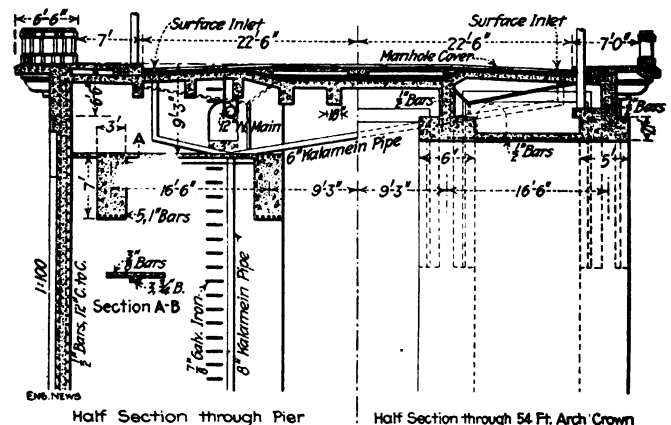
CROSS-SECTION THROUGH FLOOR OF TYPICAL ARCH
